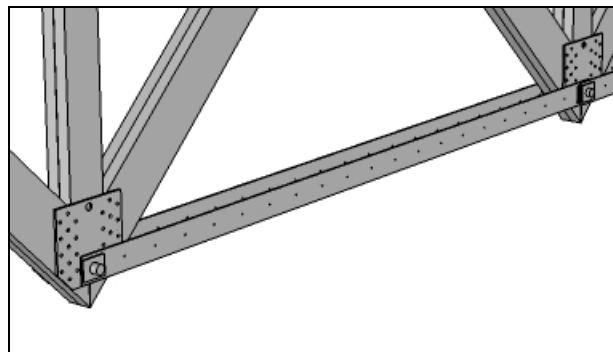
Model of bottom chord structure in Kenyan Truss
